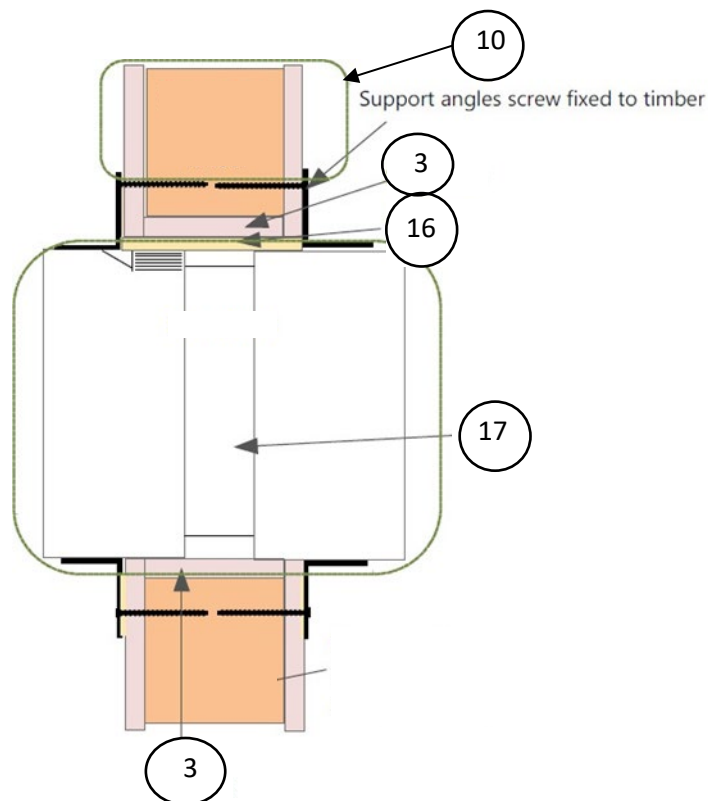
Typical damper installation detail for massive timber wall– Section view
